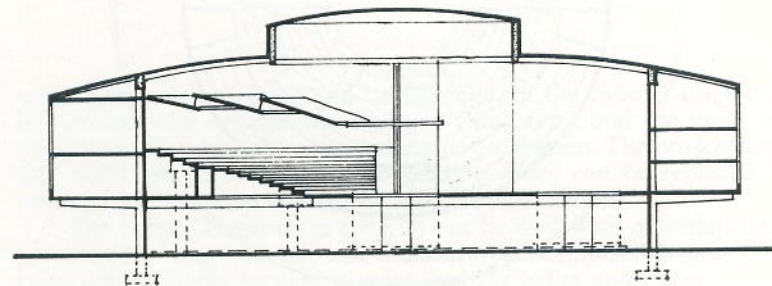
shows in outline the accommodation provided at first floor level, and the section.
